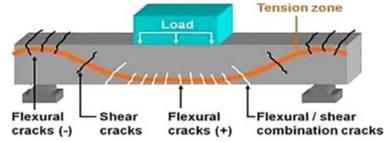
Causes of concrete cracks and bending stresses
